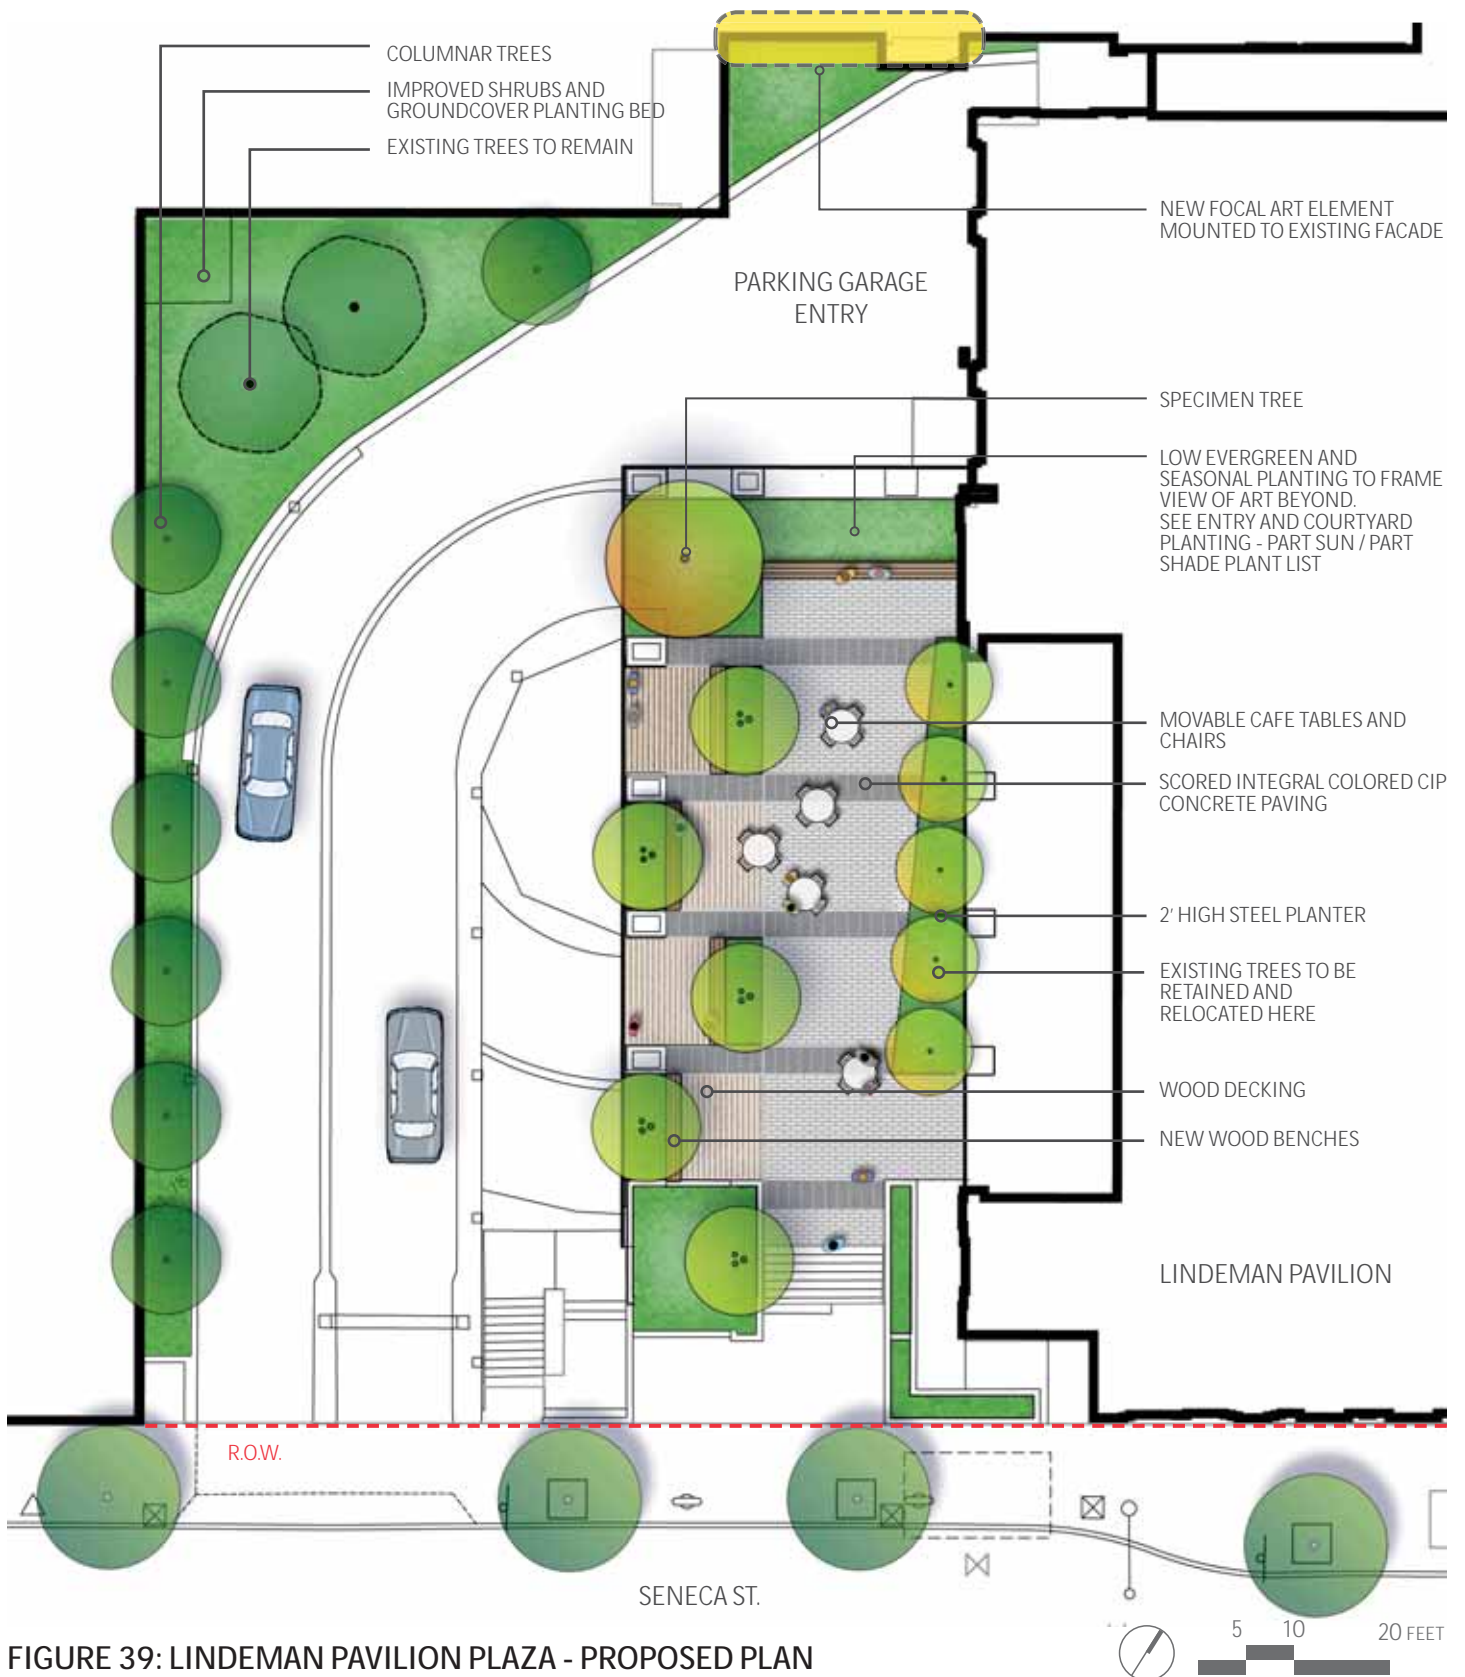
LINDEMAN PAVILION PLAZA - PROPOSED PLAN
